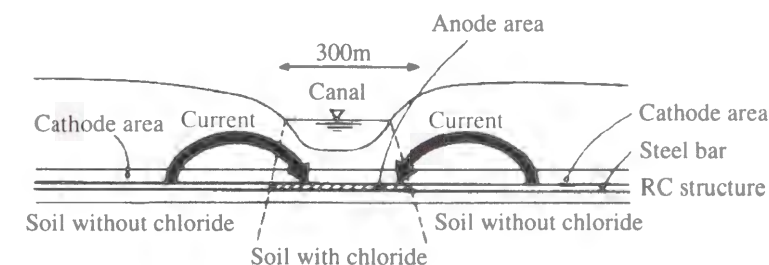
Example of macro-cell corrosion⁵⁷⁾
